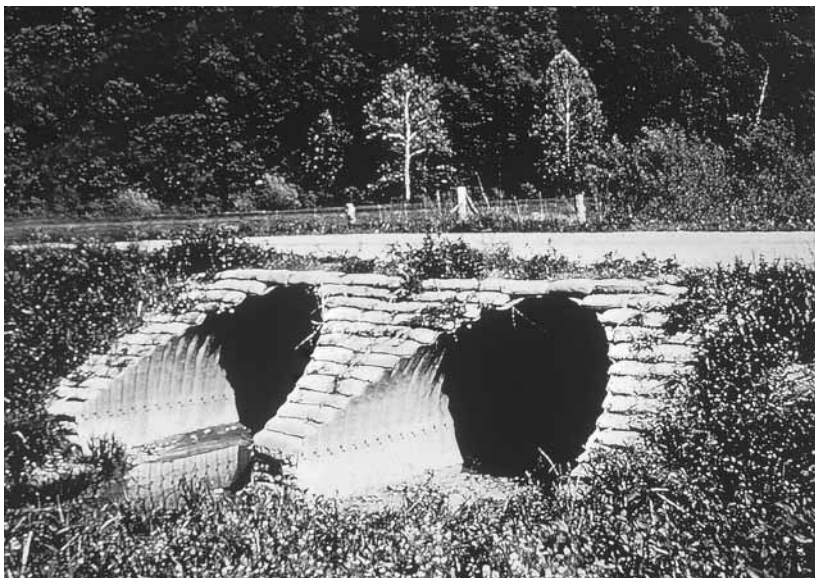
Embankment erosion protection using bags filled with sand-cement mixture.
